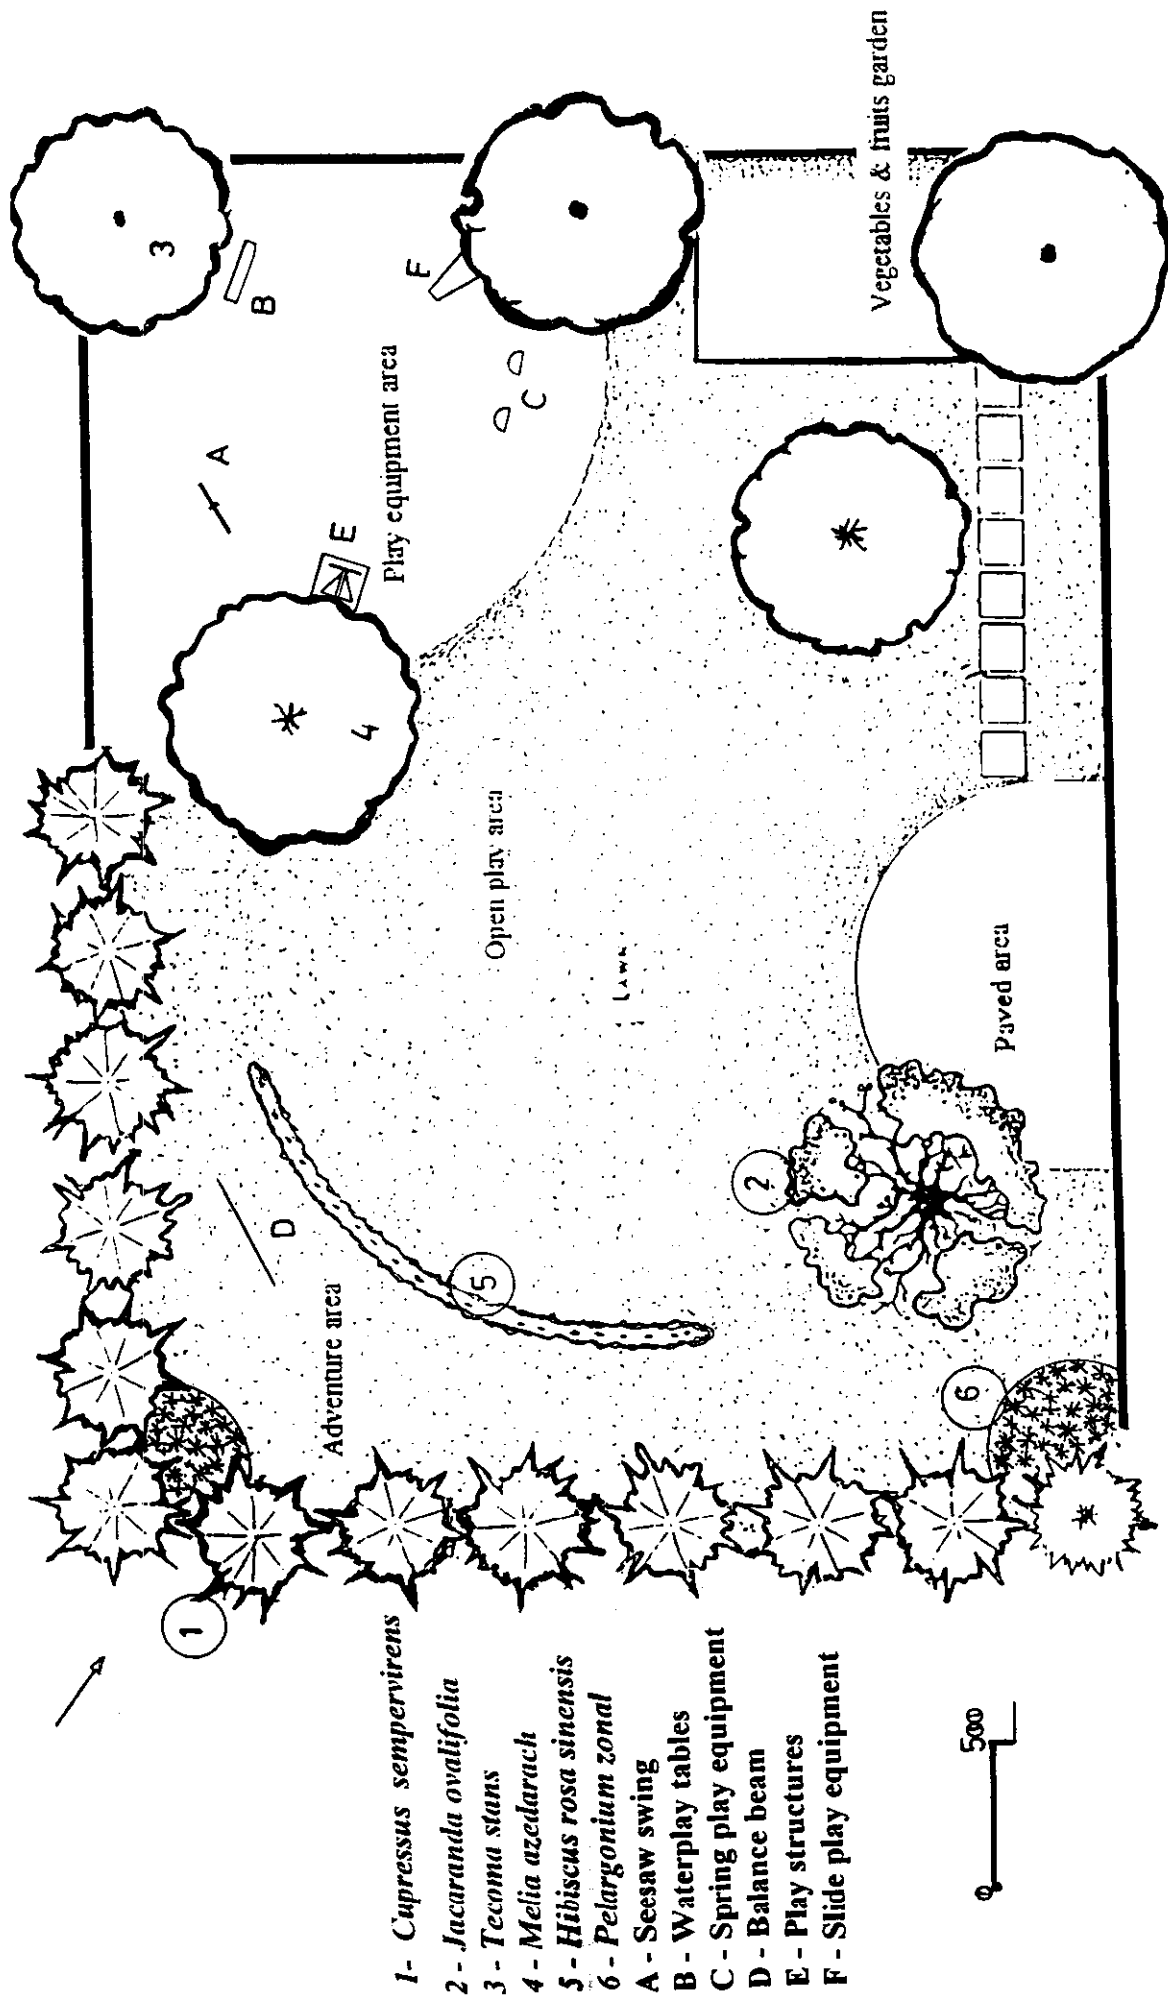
A proposed design for kindergarten garden in area 600 m .
